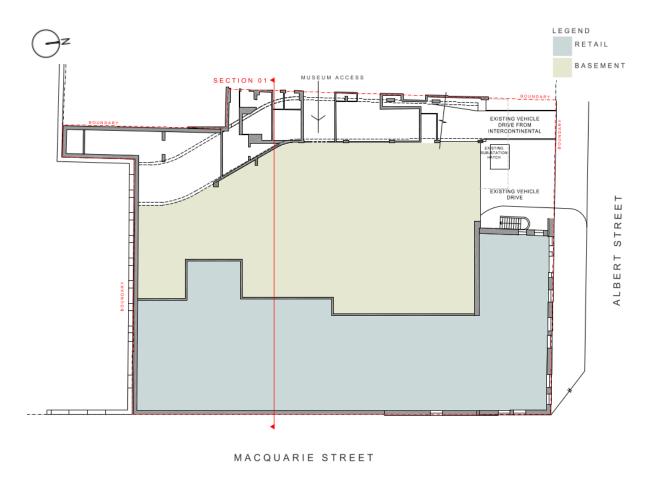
Proposed maximum envelope plan of lower ground floor level/ basement 1
